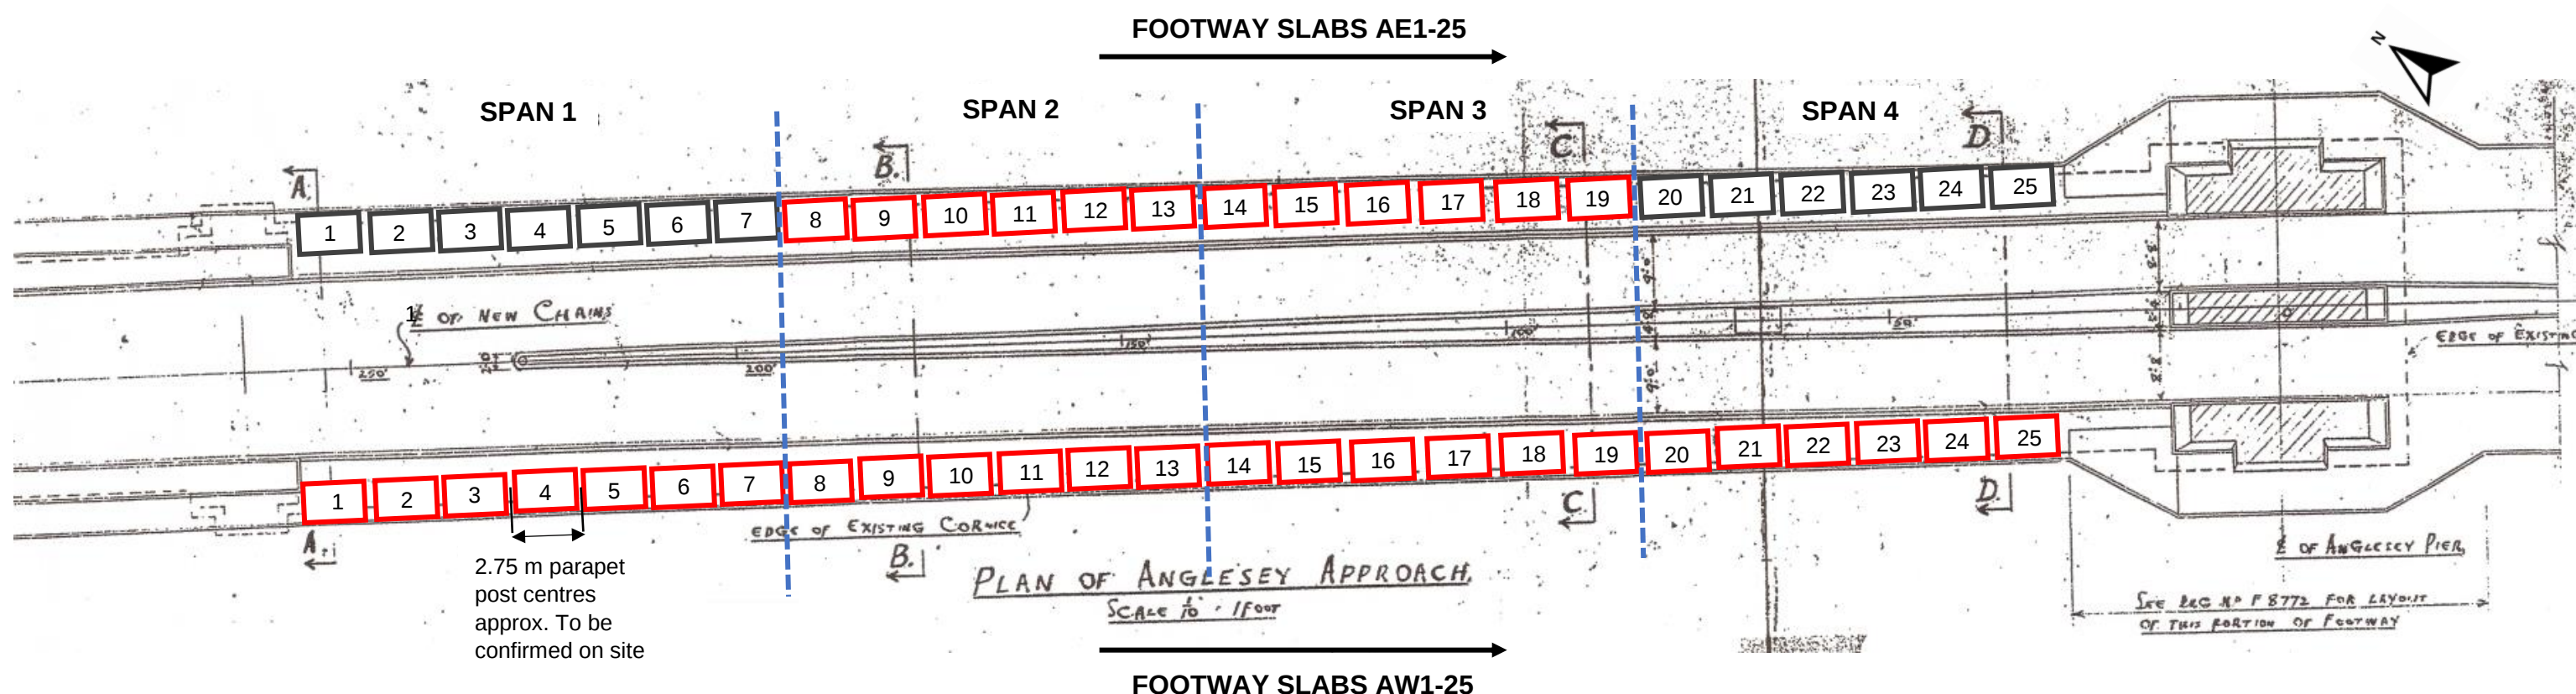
Plan of Anglesey Approach highlighting footway panels and spans
